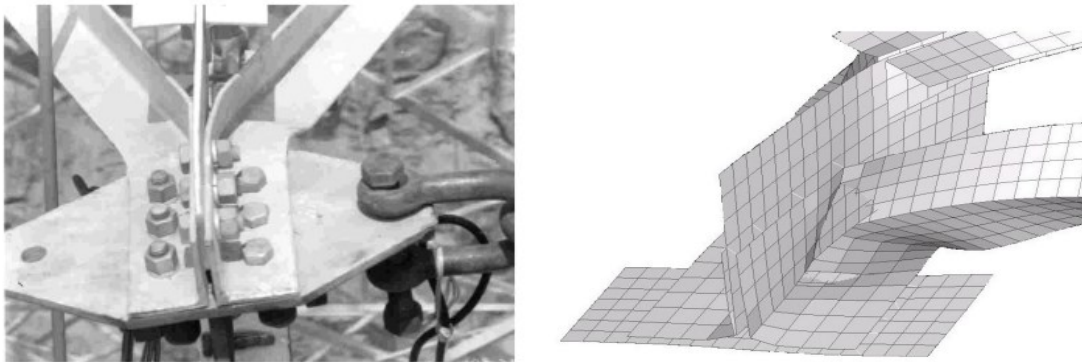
Local Buckling of cross-arm member and shell element modelling members [5]
